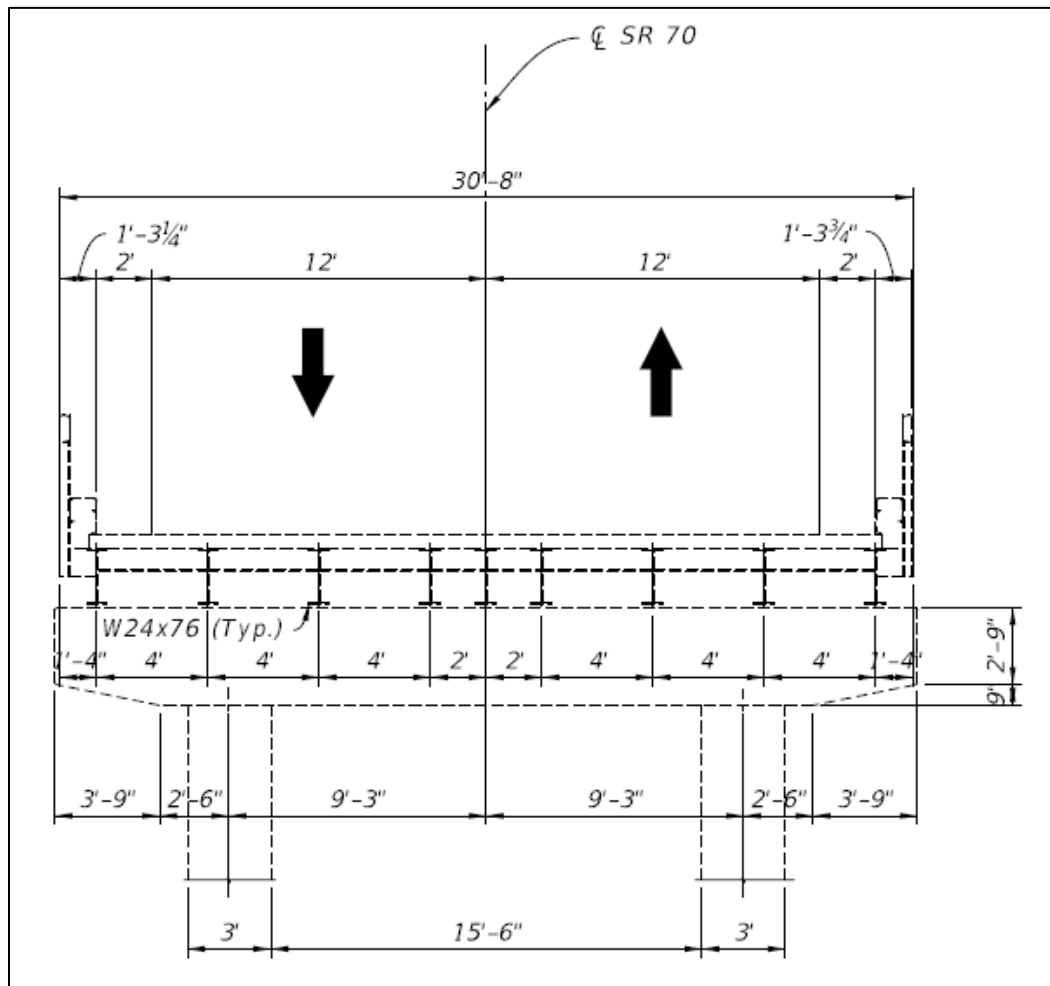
Existing Bridge Typical Section Main Spans (Bridge No. 910001)
